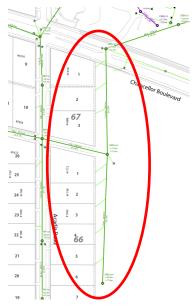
Existing 300mm Storm Sewer behind Acadia Road
